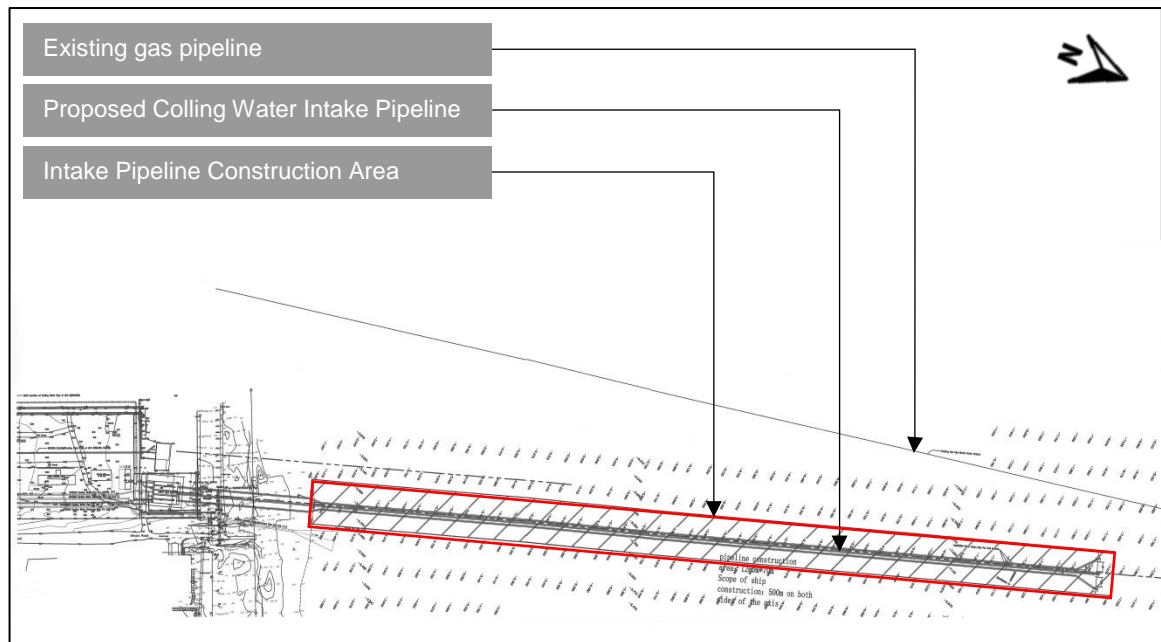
General layout of the proposed cooling water intake pipeline (Source: General Layout (with bathy).jpg, received on 7th February from Sinohydro)
